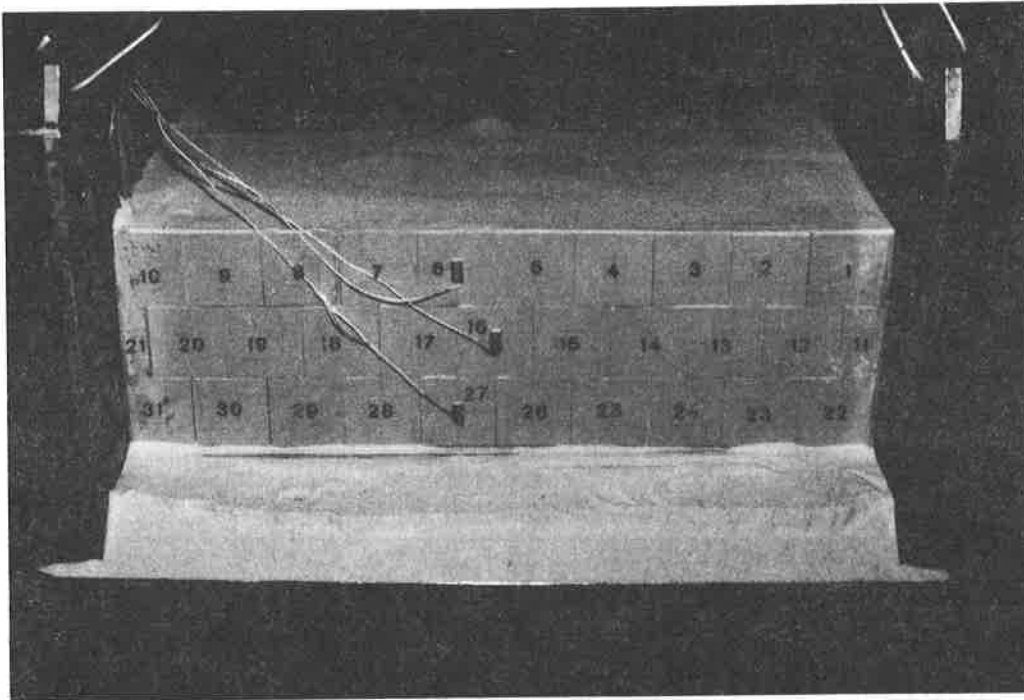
Typical Model Reinforced Soil Wall (Olen, et. al., 1993).
